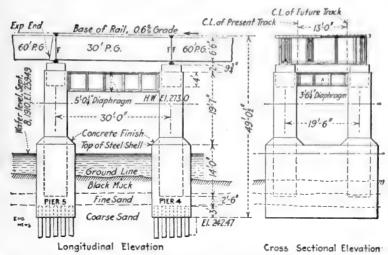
Steel Tubular Piers, Oxford Mill Pond Bridge, Chicago & Northwestern Railway.
